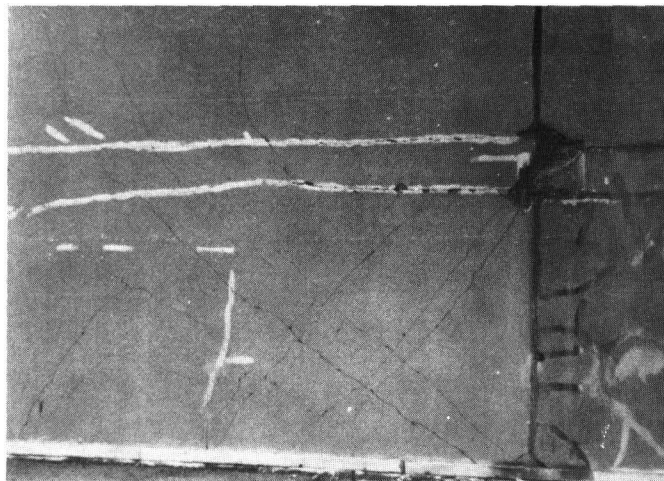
Pacoima Memorial Lutheran Hospital, east shear wall diagonal cracks. White lines are patching before earthquake. D. F. Moran photograph.
